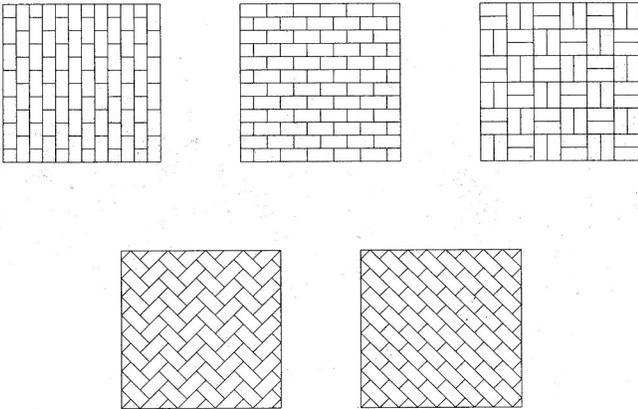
Preservation and maintenance of historic brick sidewalks is highly encouraged, including replication of the prevalent, existing brick pattern.
